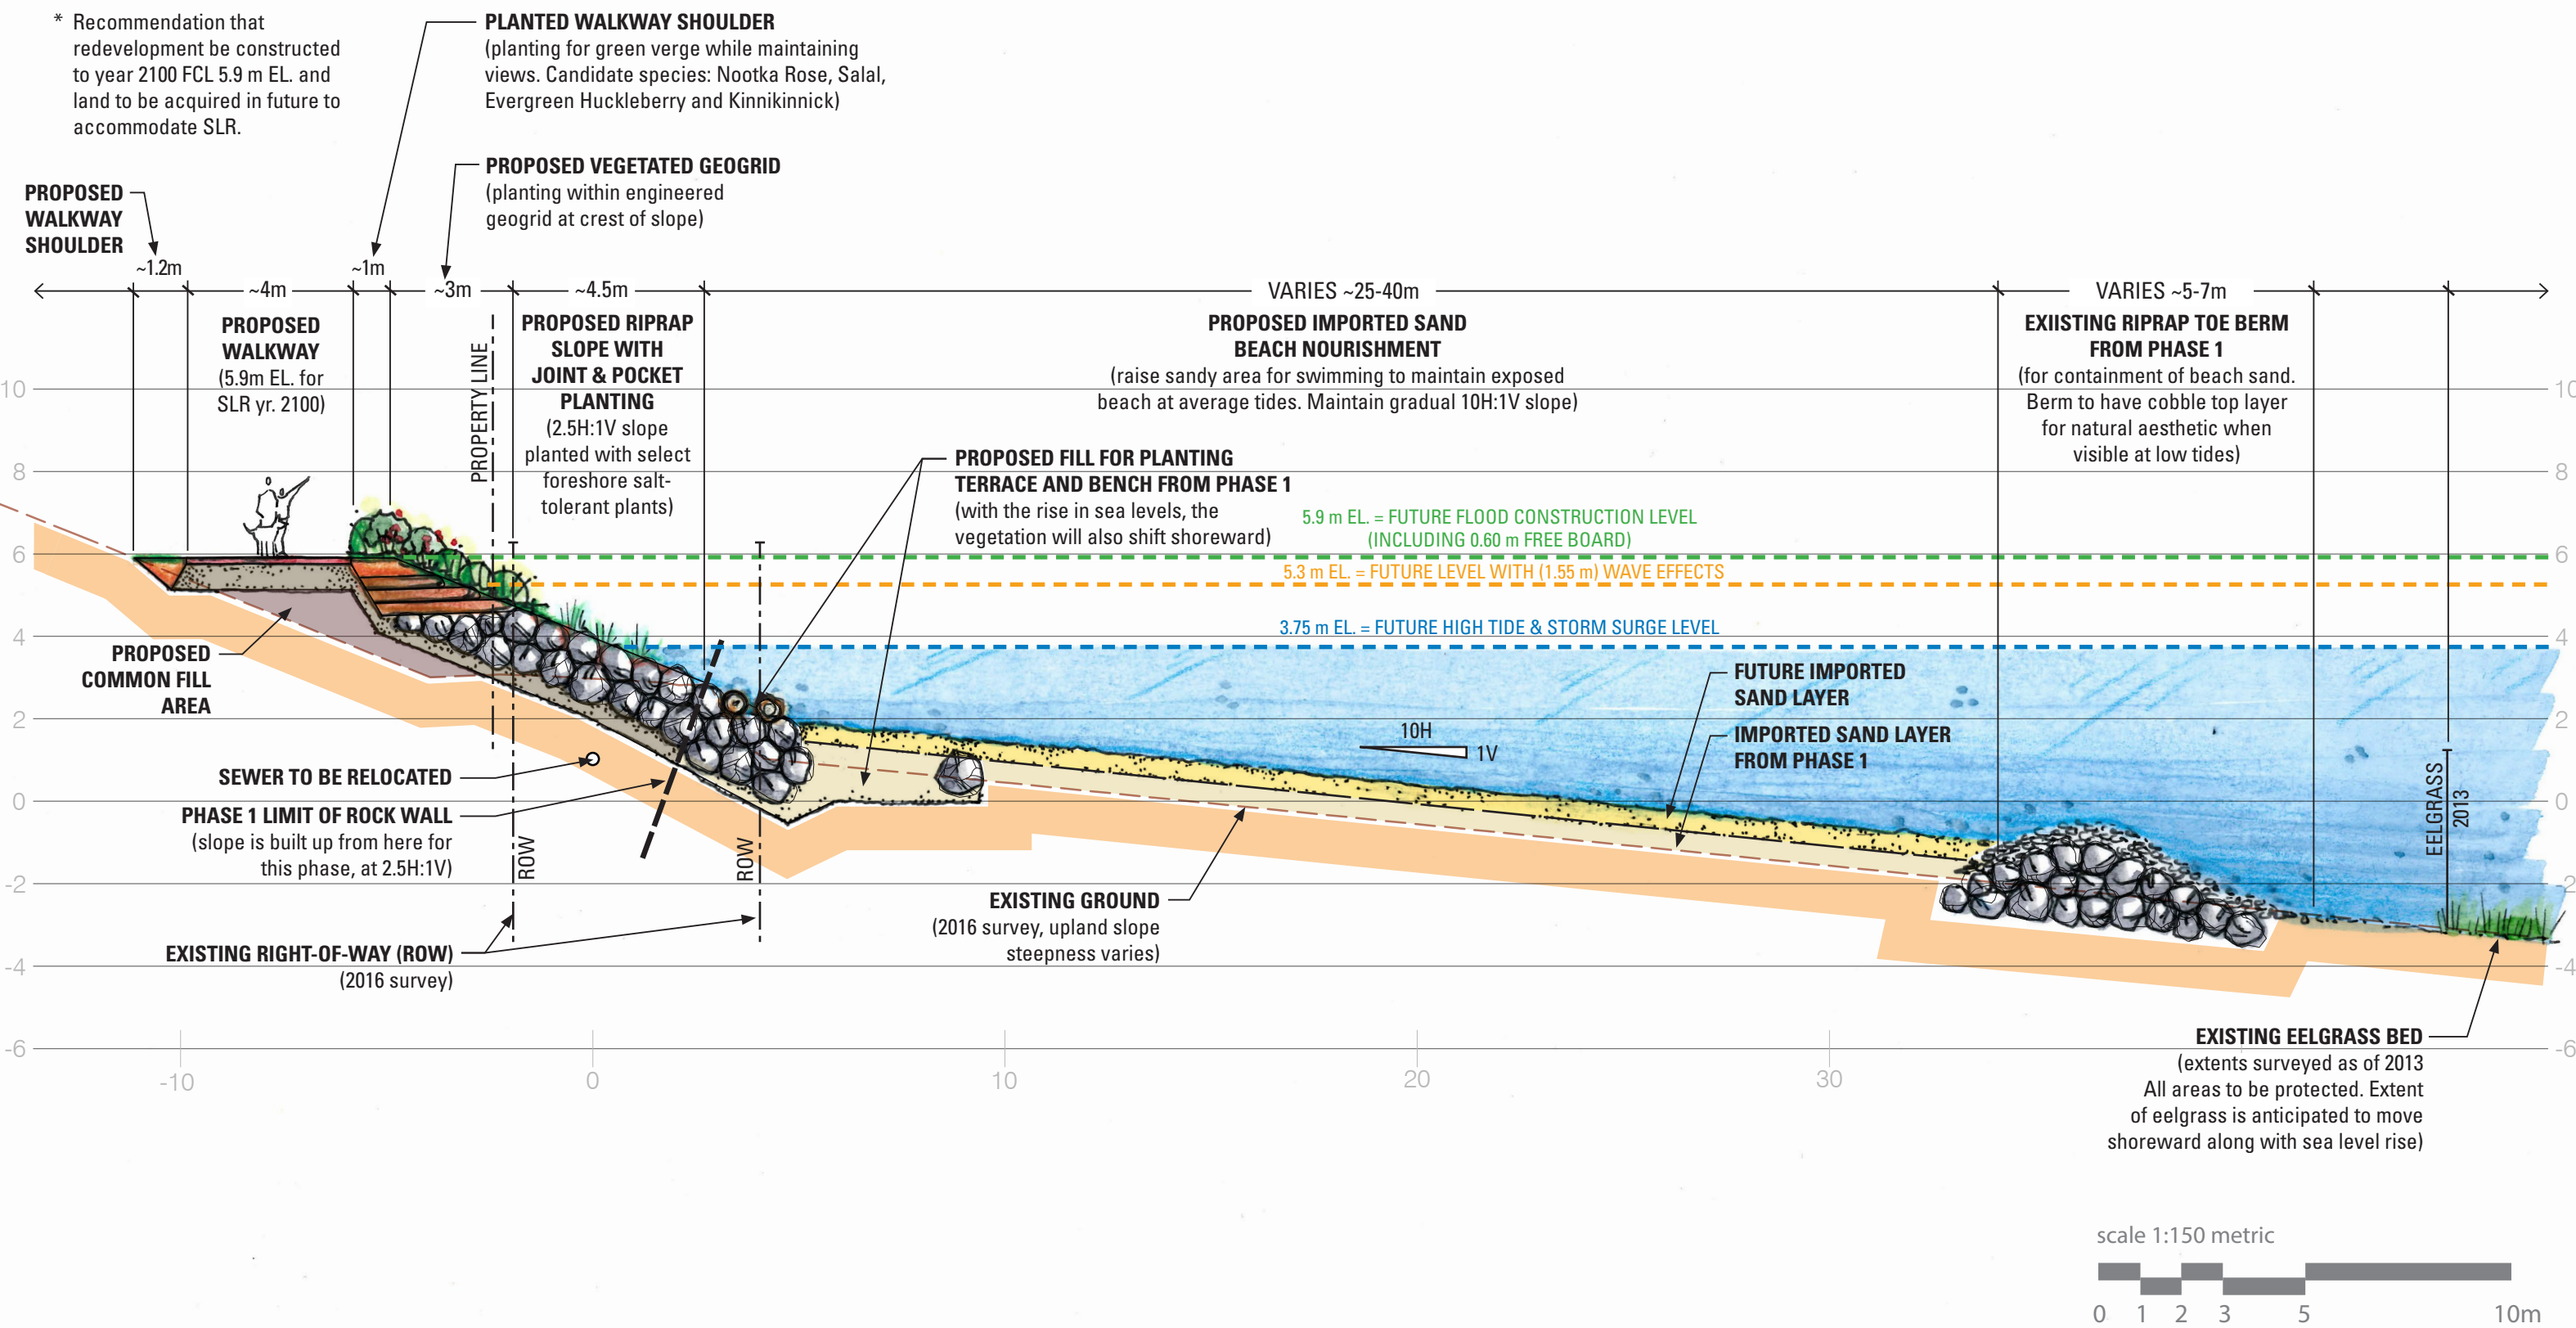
| TYPICAL SECTION - SHORT-TERM
